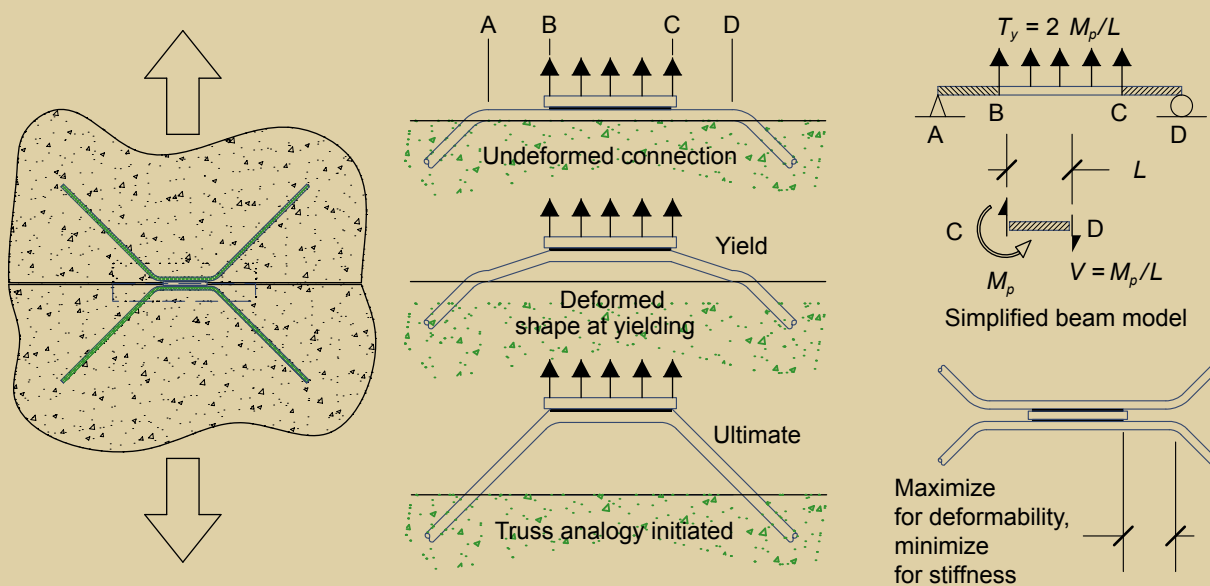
This simplified beam model was proposed. Also shown are the hairpin, undeformed connection, deformed shape at yielding, truss analogy initiated, and detailing for the proposed beam model. Note: L = distance from end of slug weld to bar bend; M_p = plastic moment; T_y = yield strength of the connection; V = shear in hairpin at yield.
